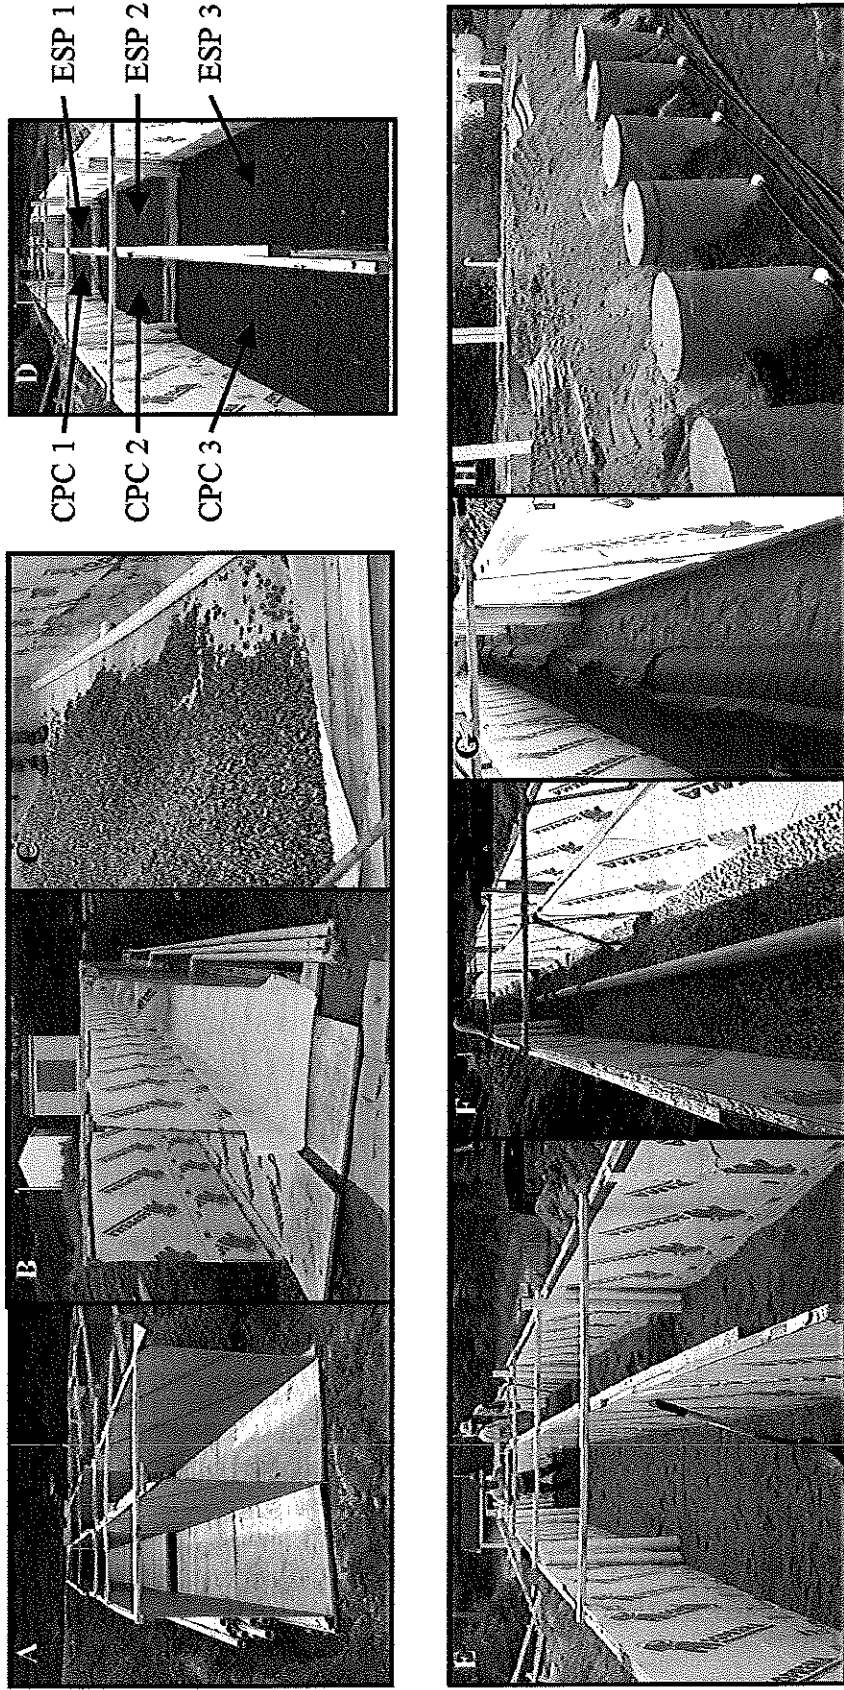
Installing model Enviro-Septic® and conventional pipe and stone leaching systems in Stoke, Quebec. A) Plywood-encased trenches, 60' long x 3.5' wide, were divided lengthwise into three sections. Note the final 20' sections are 6" deeper than the first two 20' sections. B) A waterproof membrane and plastic canvas were applied to both trenches, and drain pipes attached to each section. C) Stone and 3" perforated PVC pipe allowed leachate to drain from the bottom of each trench section. D) The same amount of stone covered each section's bottom. The sections, deemed CPC 1, 2 and 3, can be seen here. E) A layer of clean medium-coarse sand covered the stone. The two trenches are identical at this point. F) For the conventional model system, a 60' length of standard 4" perforated PVC pipe was installed in crushed stone. G) In the other trench, sixty feet of Enviro-Septic® pipe were installed within a layer of sand. H) Leachate from each trench section drained to a separate drainage receptacle (green cylinders), where its volume was continually measured, and samples were taken for comparative analysis. Leachate in the drainage receptacles was then pumped (via black hoses) to the Stoke municipal sewage treatment area located just downhill from the test site.
